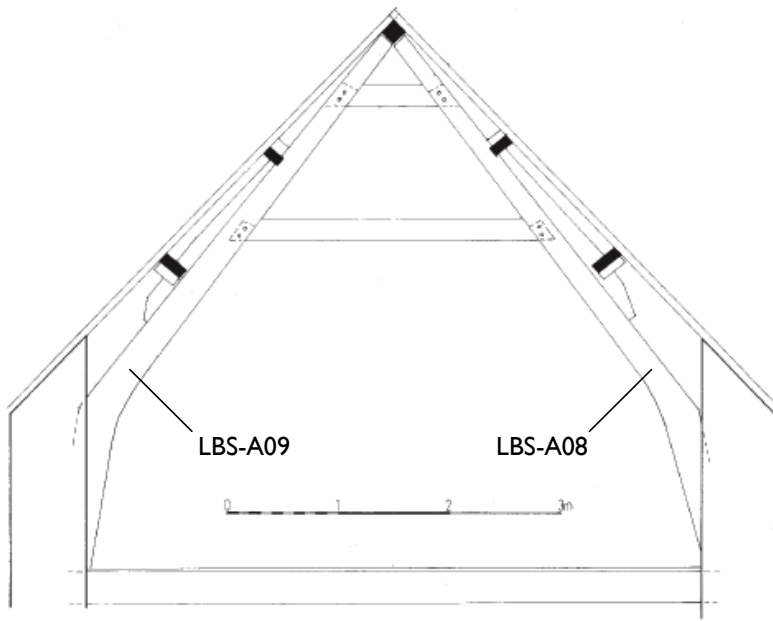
East range; truss 1 (east face), showing the location of samples LBS-A08–09 (Martin Roberts)
